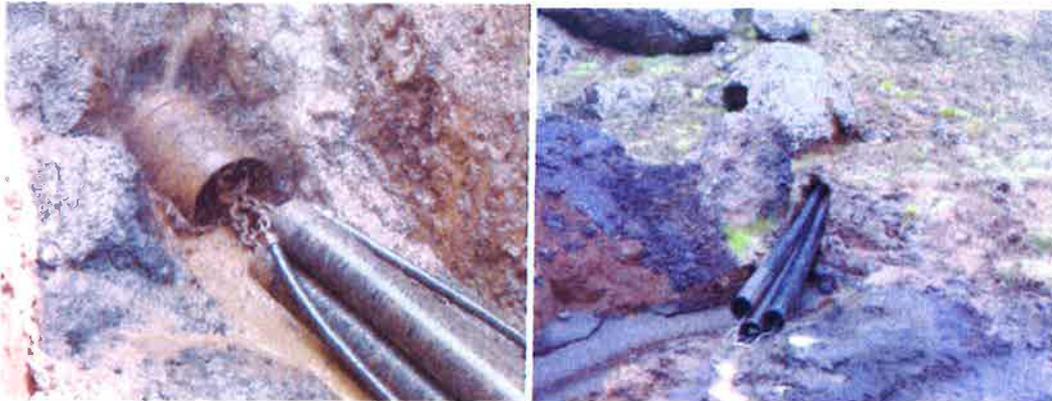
Underground drilling at Dyradalir, during the installation of Nesjavallalína 2 (2009).
